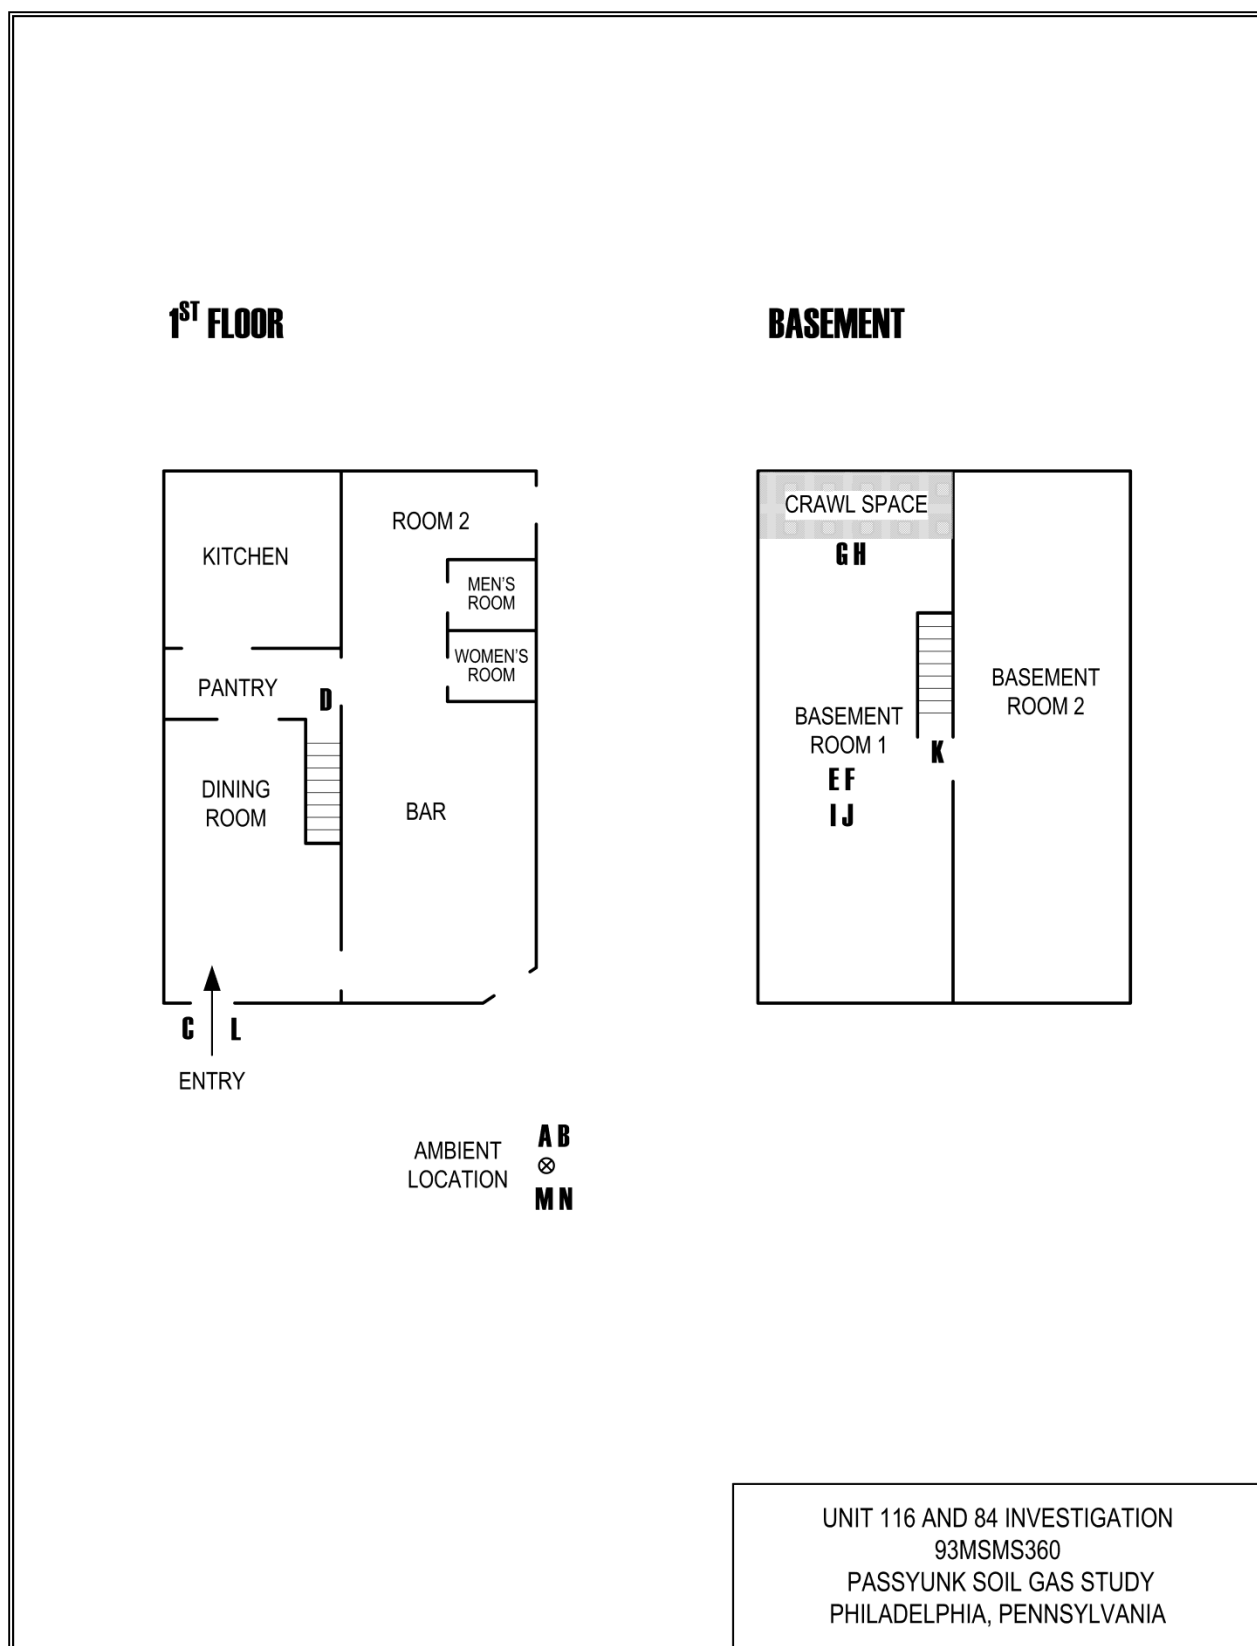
Unit 116 and Unit 84 Floor Plan, 93MSMS360
